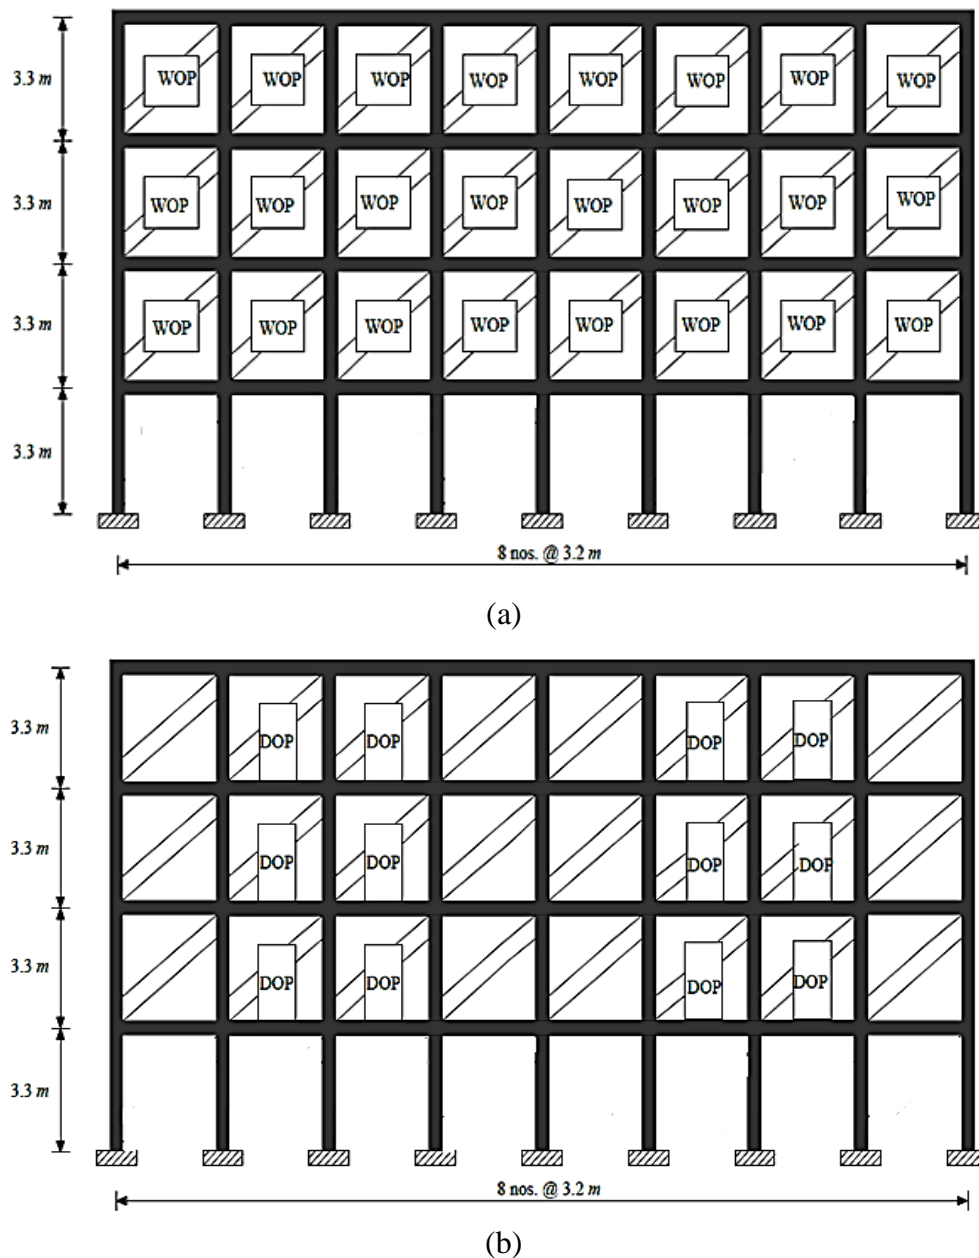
Location of windows (WOP) and doors (DOP) (a) external frame; (b) internal frame
